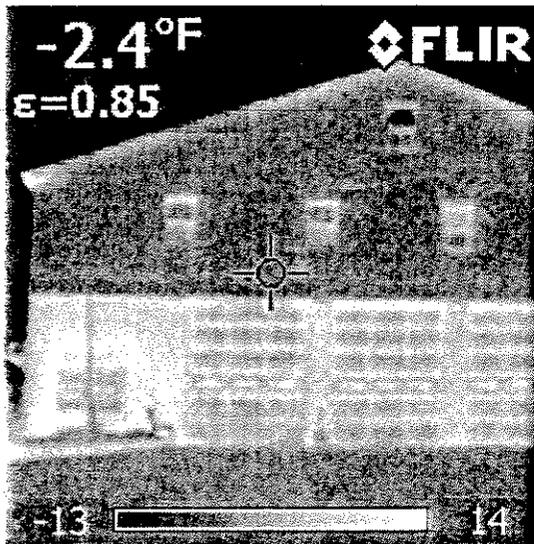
York Village Fire: Uninsulated block wall 1st floor, insulated frame wall second floor
